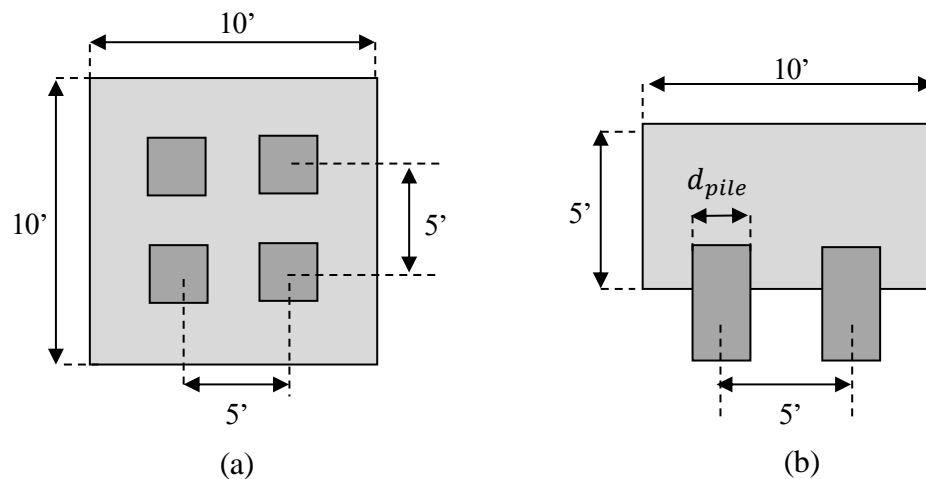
Pile cap details (a) Plan view (b) Cross section
